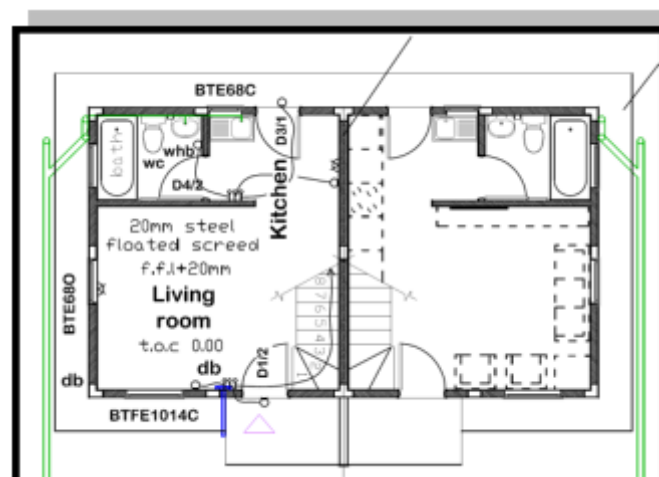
TYPOLOGY C – GROUND FLOOR PLAN
